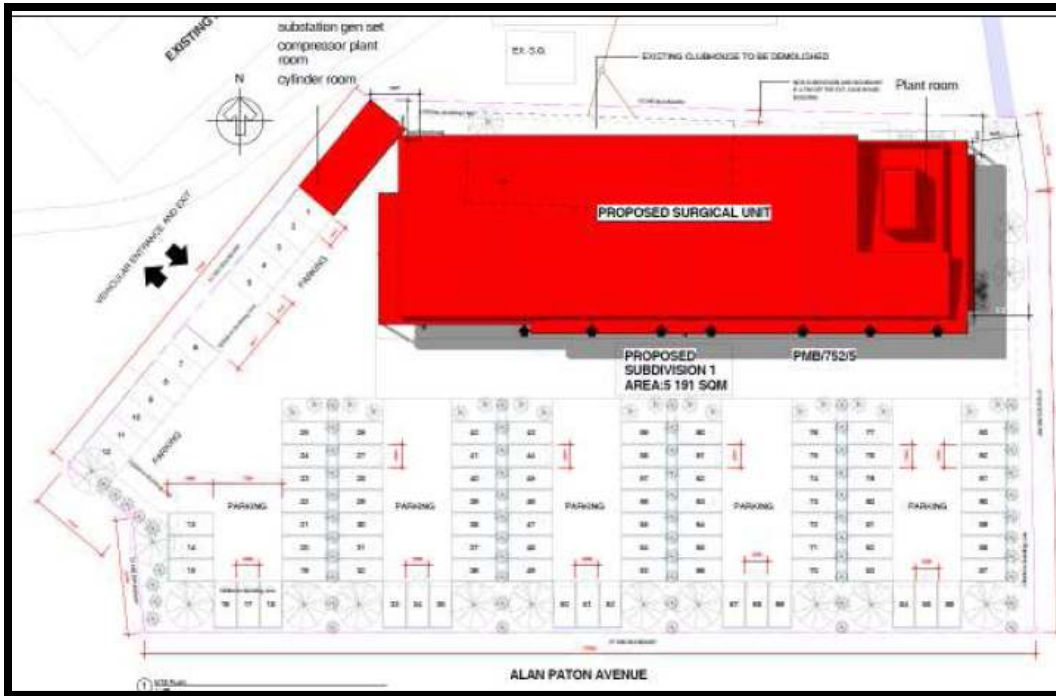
Proposed layout plan of the Eye Hospital at 5 Alan Paton Avenue, Pietermaritzburg (Source: JEC).
